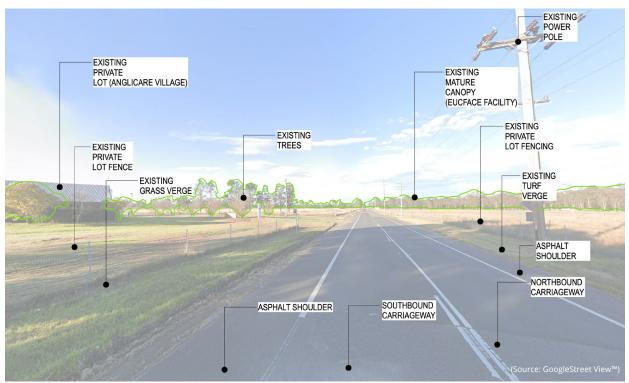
Viewpoint 12 - Entry to Anglicare retirement facility, Londonderry Road (facing south) - Existing view
